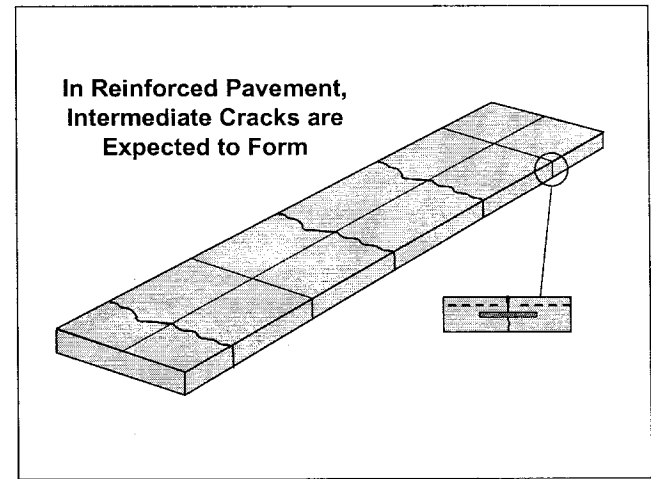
Jointed reinforced pavement with distributed steel and dowels
